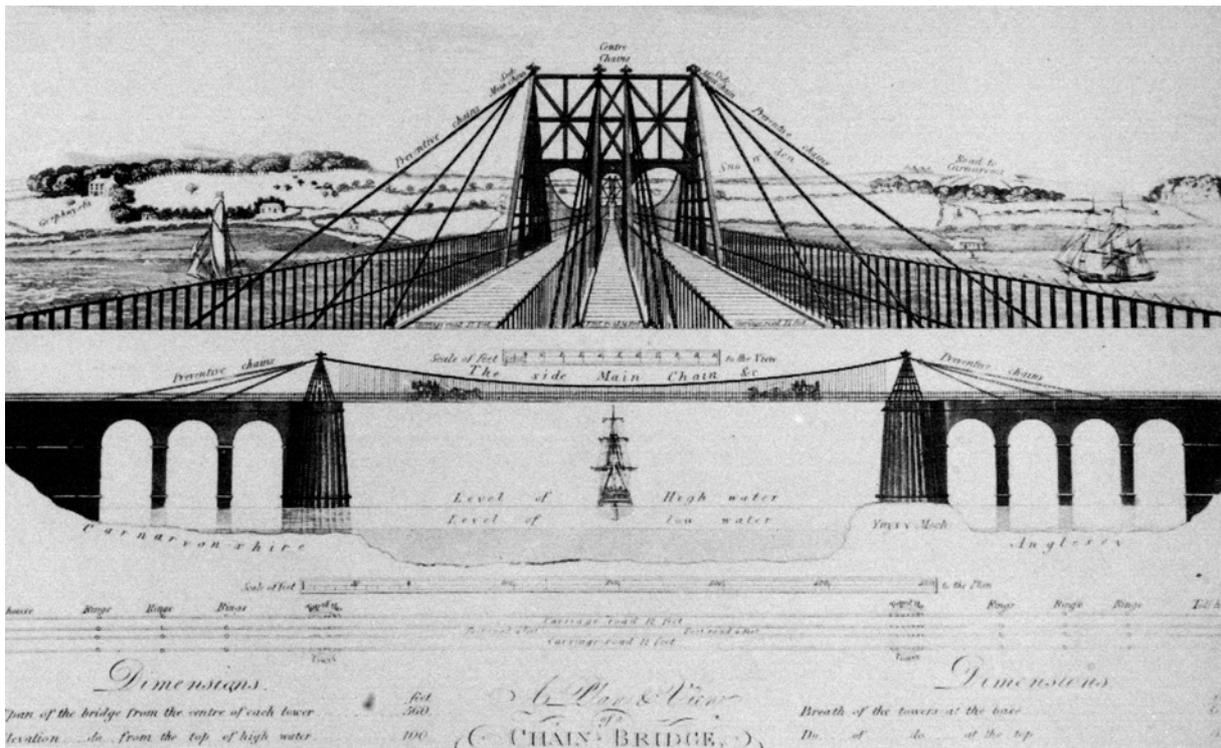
Telford's 1818 Menaï Suspension Bridge proposal using wire cables anchored like stays into masonry of the approach viaducts. (Penfold)
